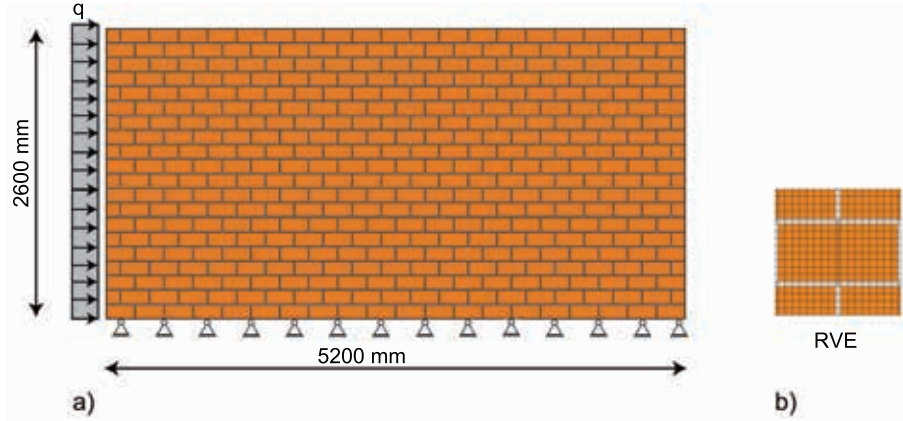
Rectangular masonry wall: geometry and boundary conditions at structural level (a); RVE (b).
